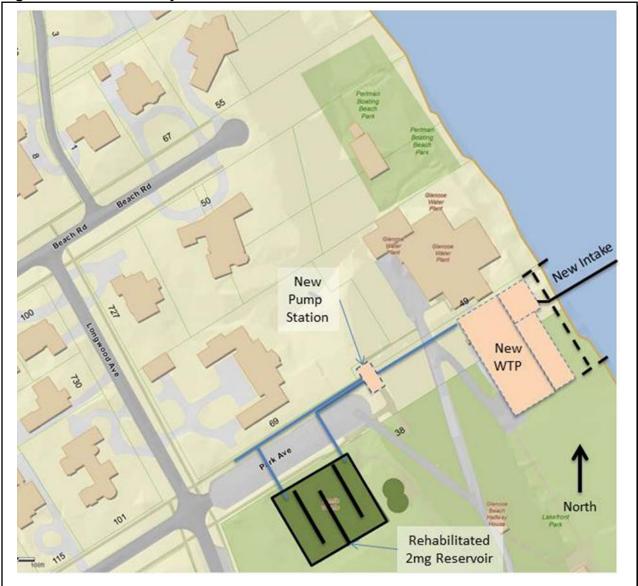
Preliminary Site Plan–South Lakefront WTP Location
